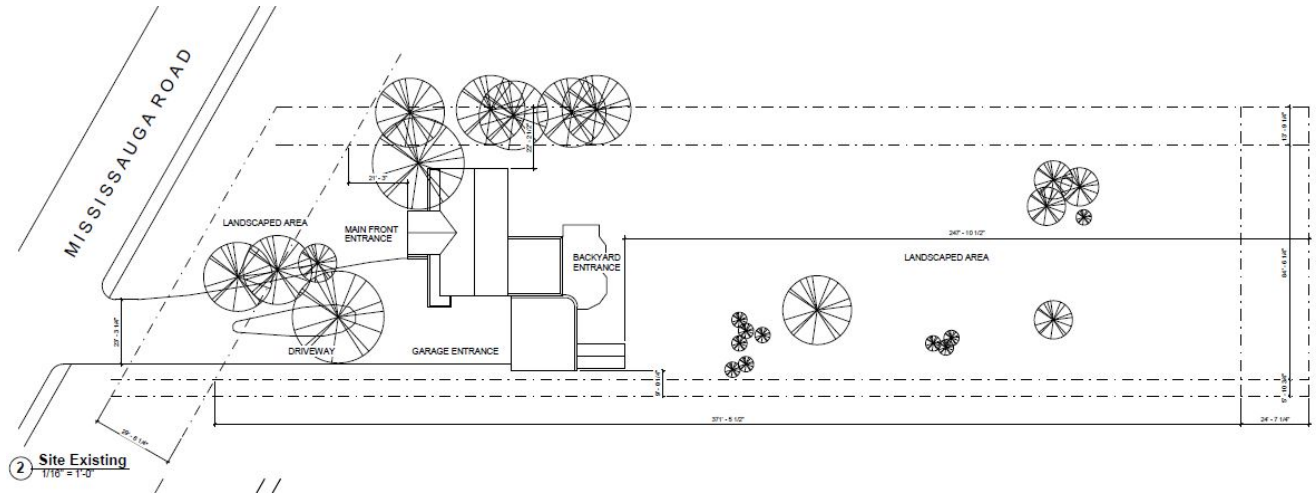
Existing site, 2230 Mississauga Road. (Image from client.)
